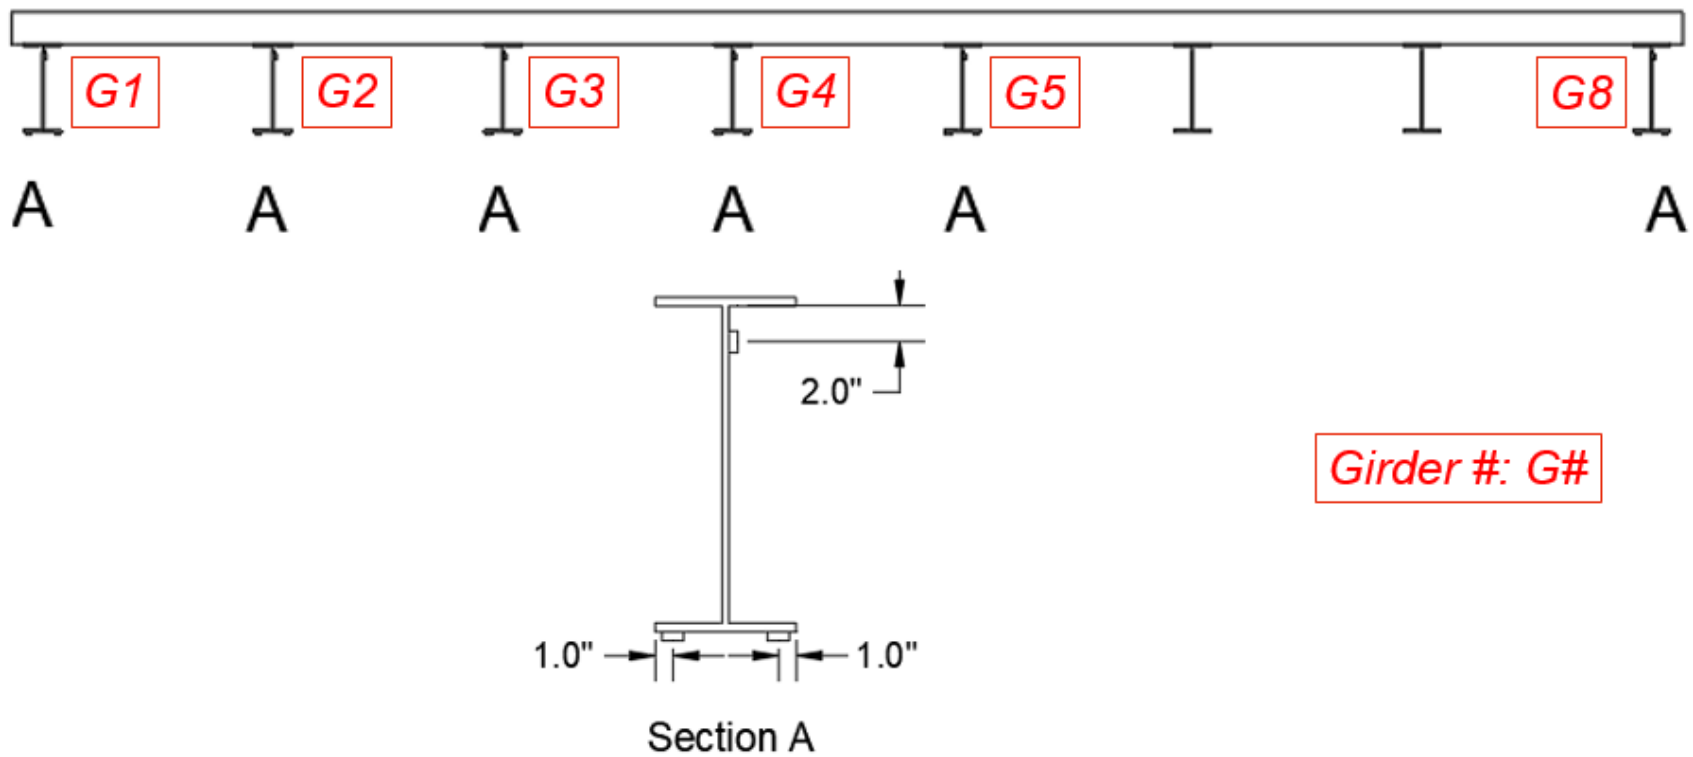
Cross-Section View of Sensor Layout (looking north) for 1<sup>st</sup> Yutan Bridge Load Test
